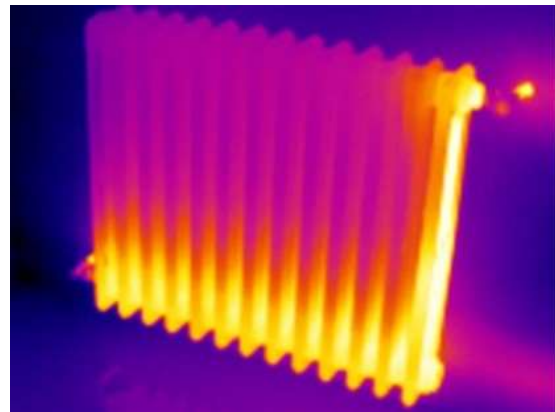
R113. Molten iron cold-top radiator due to the presence of air.
